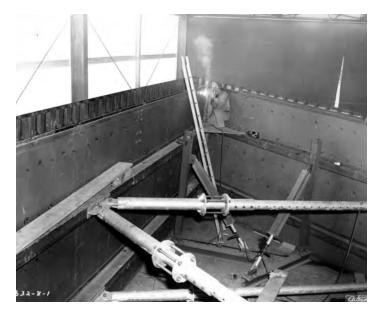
Shop assembly of the Arch segments, showing internal temporary framing for placement and installation. Source: JNEM archive, image V106-3946
